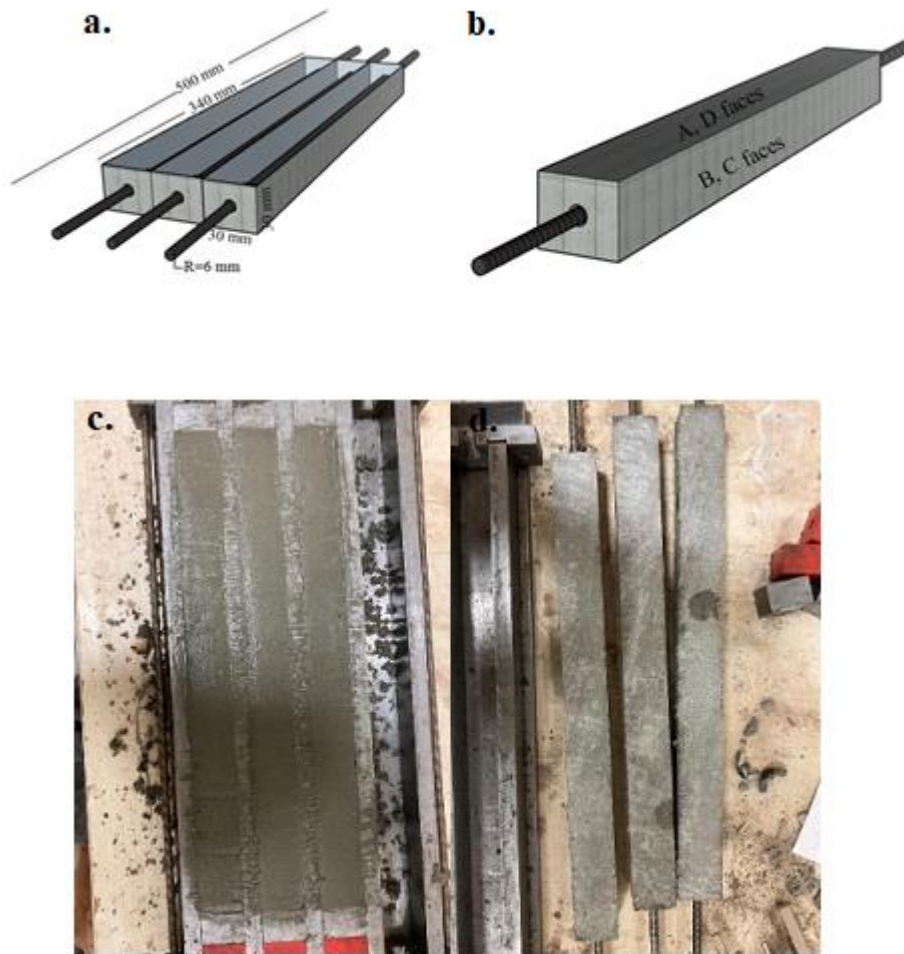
Stainless steel molds were used for preparation of all mortar batches; a) dimensions of the molds; b) naming of the faces of each specimen ‘A’ as troweled top face, ‘D’ as bottom face, ‘B’ and ‘C’ are side faces; c) mortar pouring; d) demoulded specimens.
